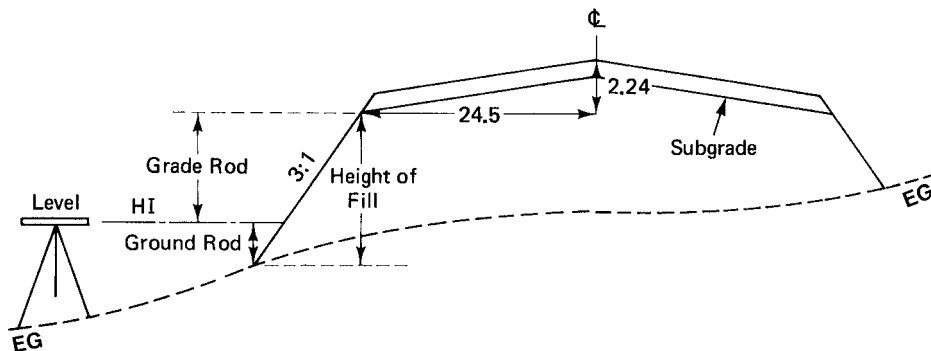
Location of a slope stake in a fill section. Case 2: instrument HI below subgrade.
